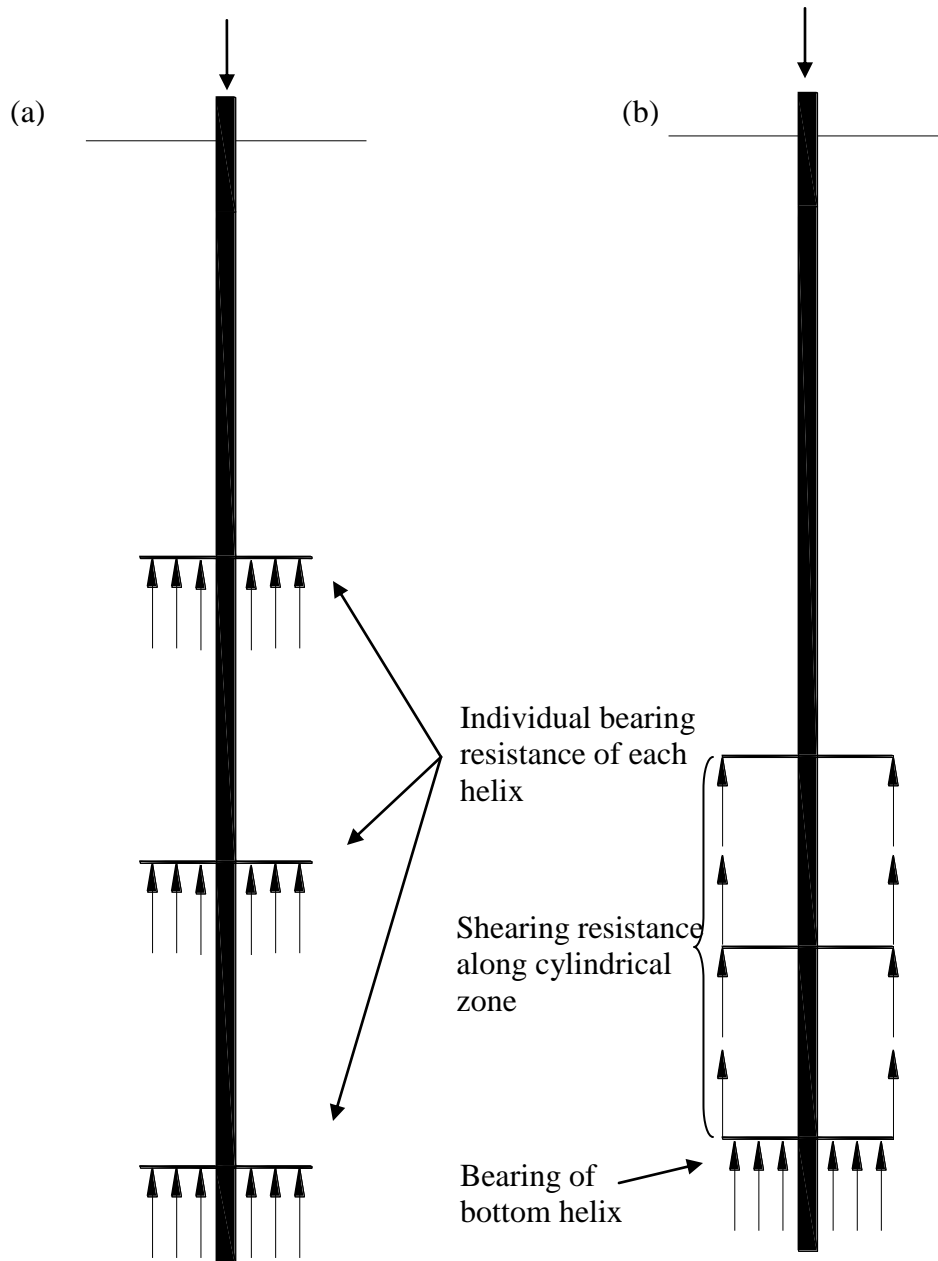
Possible failure mechanisms for helical piles under compression: (a) Individual bearing; and (b) cylindrical shear failure.
